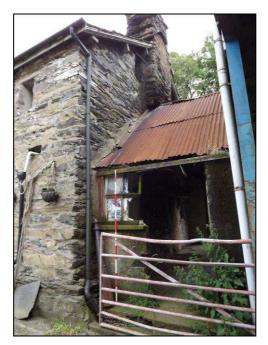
South-east gable of house showing attic window to left of the projecting chimney stack
